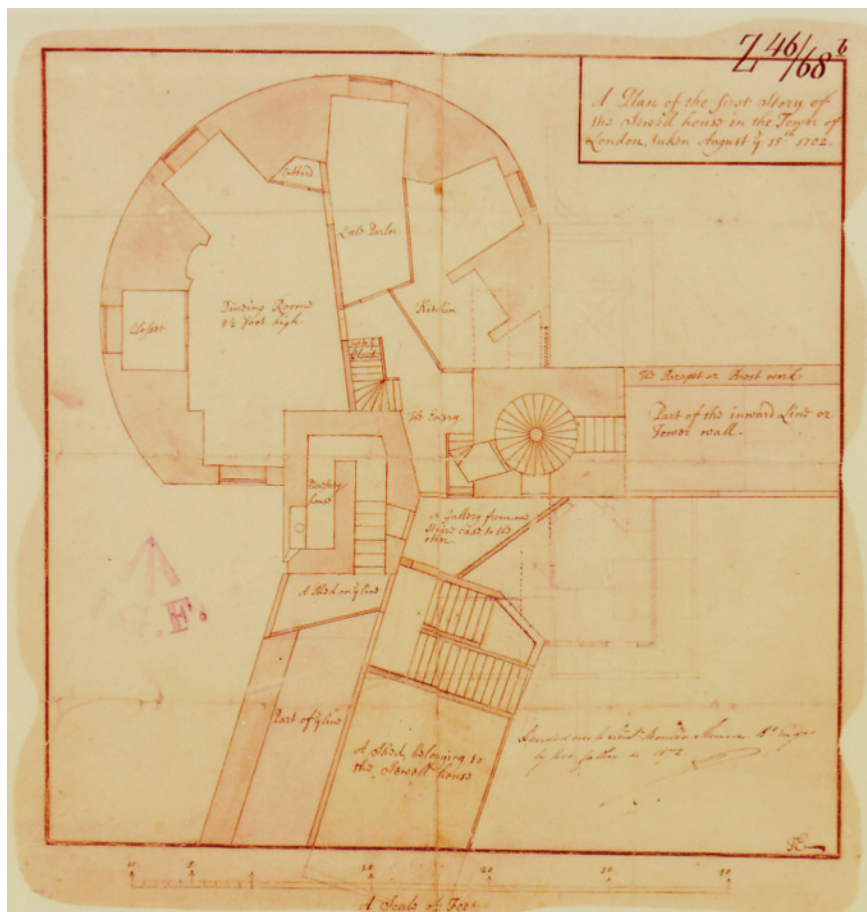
plan of the first floor of the Martin Tower dated 15 August 1702 showing the arrangement of the Jewel Keeper's apartment
